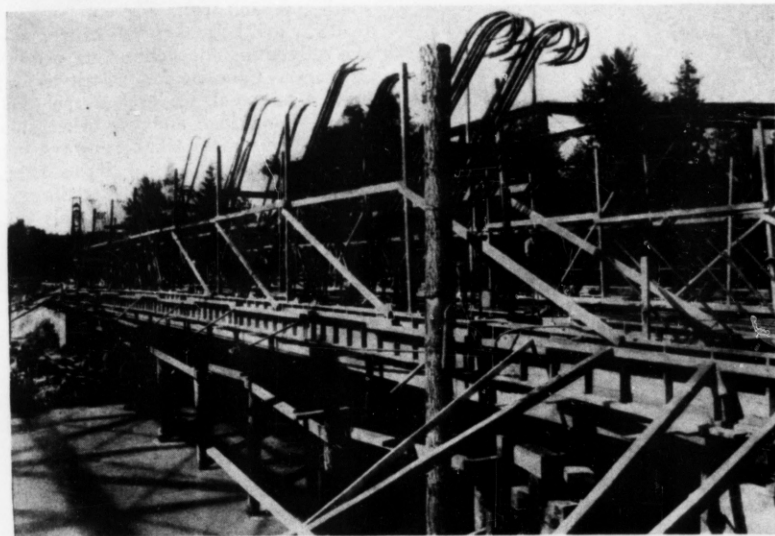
REINFORCEMENT of truss diagonals, which are placed in pairs in each panel and frame into the top and bottom chords and into the verticals through large 45-deg. fillets or brackets.
